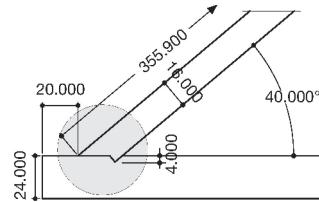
shows a cut out from CAD-Workdrawing for a kingpost truss.
